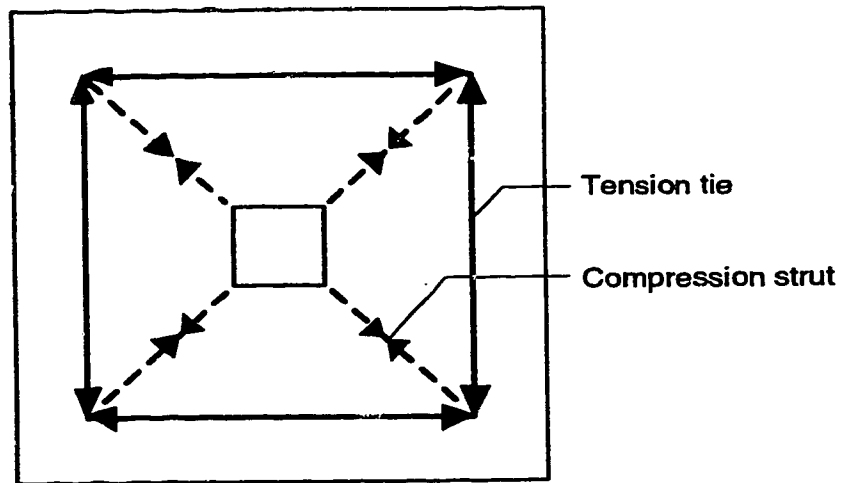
Square hoop behaviour of interior sandwich plate with unloaded slab
